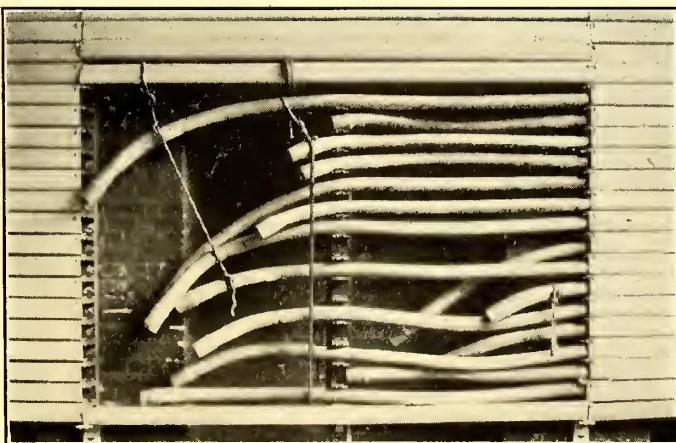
HIGH-TENSION CABLES IN TROUGHING BEFORE JOINTING, HIGH STREET TUNNEL
